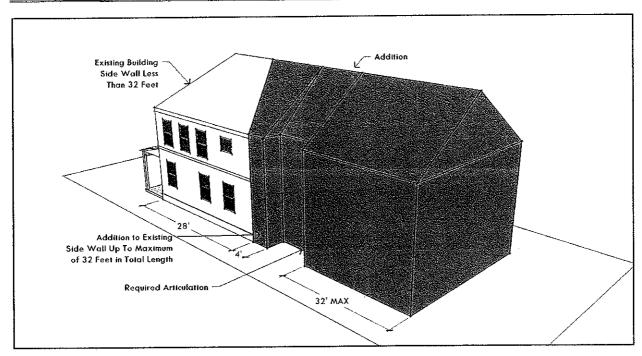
Side Wall Articulation (Existing Side Wall Less Than or Equal to 32 Feet)
